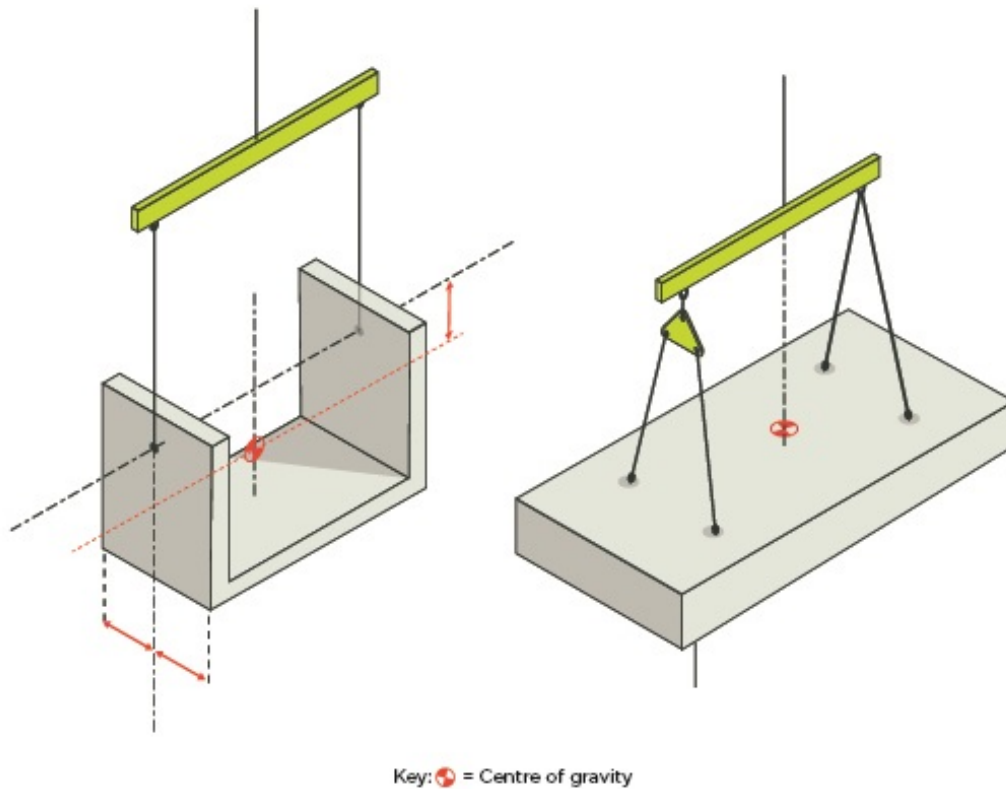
Precast concrete elements with centre of gravity below centre of lift
